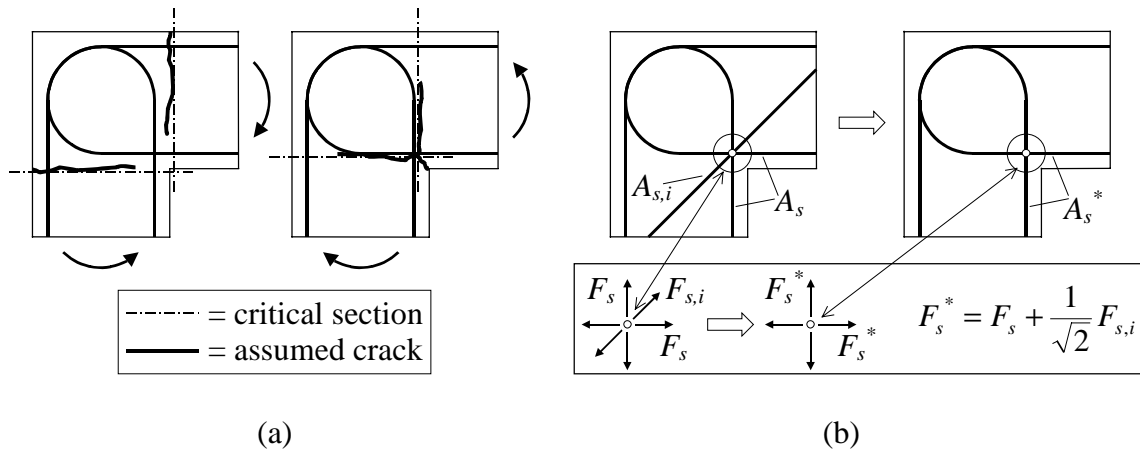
(a) Definition of critical section in closing and opening corner; (b) determination of equivalent amount of reinforcement loops when the inclined bars are replaced.
